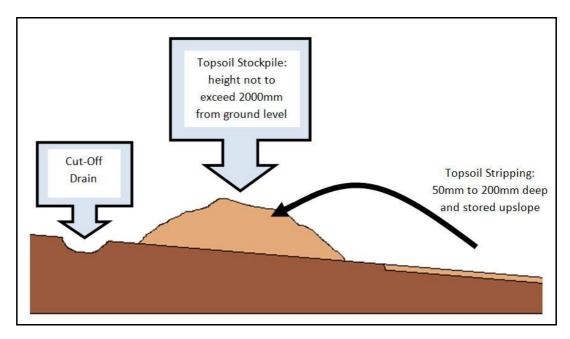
Section of a Typical Topsoil Stripping and Stockpiling Activity
